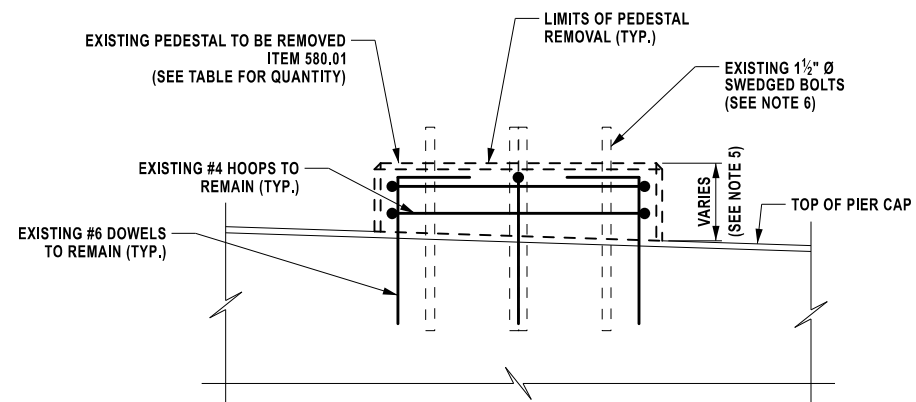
PEDESTAL REMOVAL PLAN - EXTERIOR COLUMN
